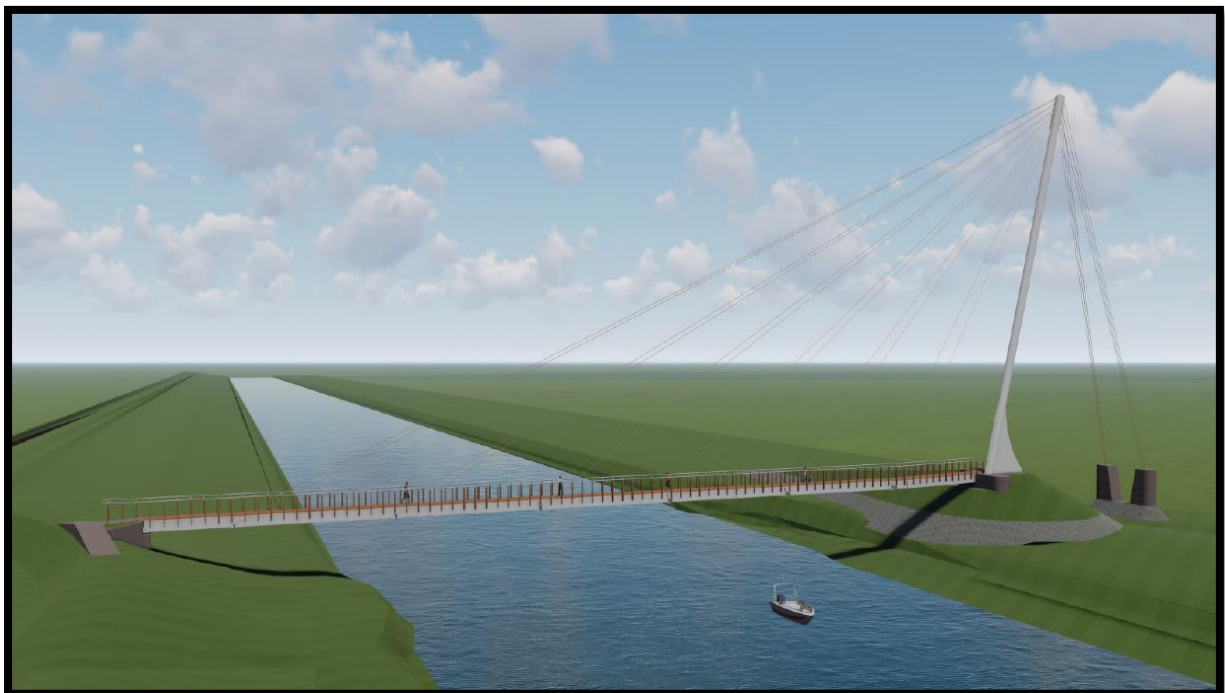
Longford Bridge, looking south (Source: Concrete Structures Ltd, 2019, extract from Appendix C)
